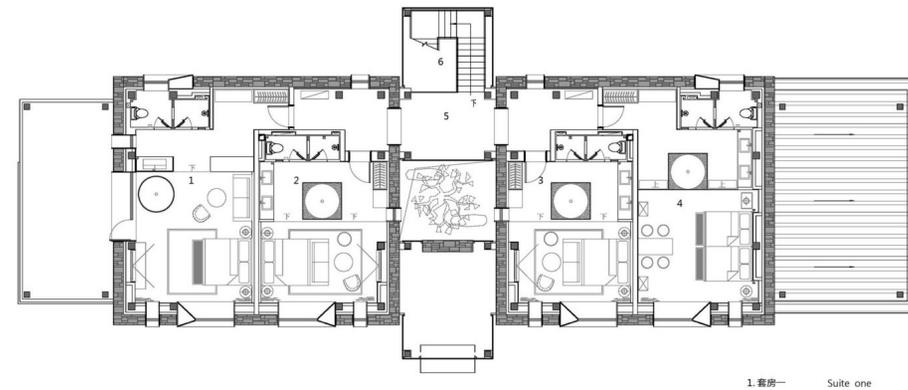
| Nanchawan · Shiwu Tribe Homestay, Floor Plan credited to [The Design Institute of Landscape & Architecture China Academy of Art]
